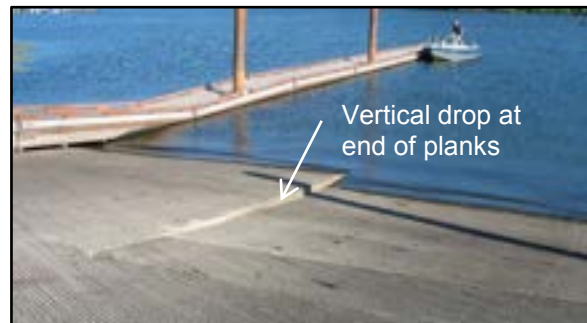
This photo illustrates the potential problem when the ends of planks occur in the launch lanes. The vertical drop from one plank to the next is excessive. This problem was corrected by removing the right-side planks, adjusting the rails and grade rock before reinstalling the planks.
